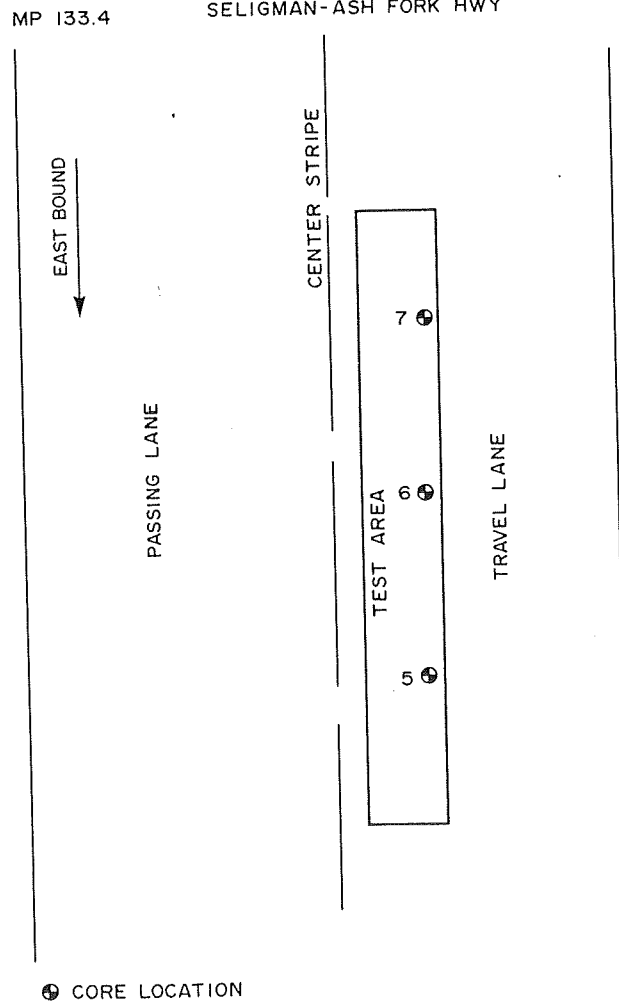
LOCATION OF TEST SECTION, I-40 E. B
